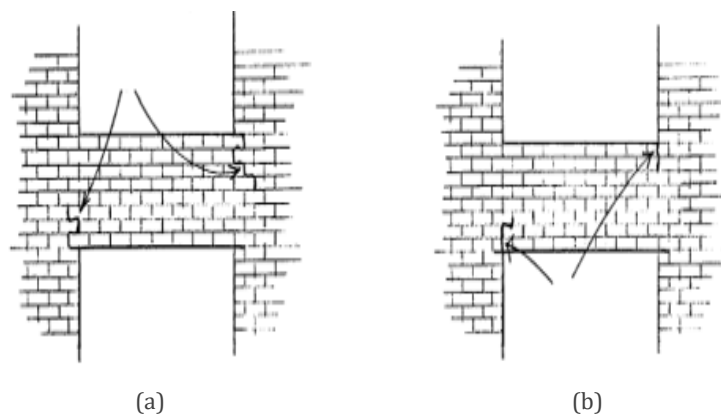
Spandrel joint sliding (a) and Spandrel unit cracking (b) (FEMA 306(1998))
